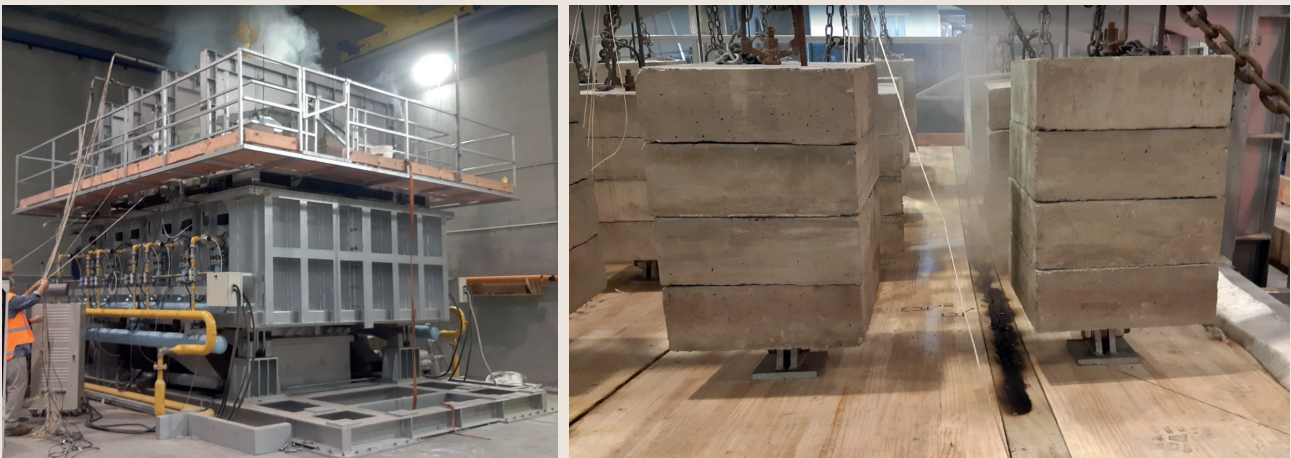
AS1530.4 Fire test of a loaded timber floor. Concrete blocks used for loading the floor during the test (Credit: Fire TS Laboratory)
